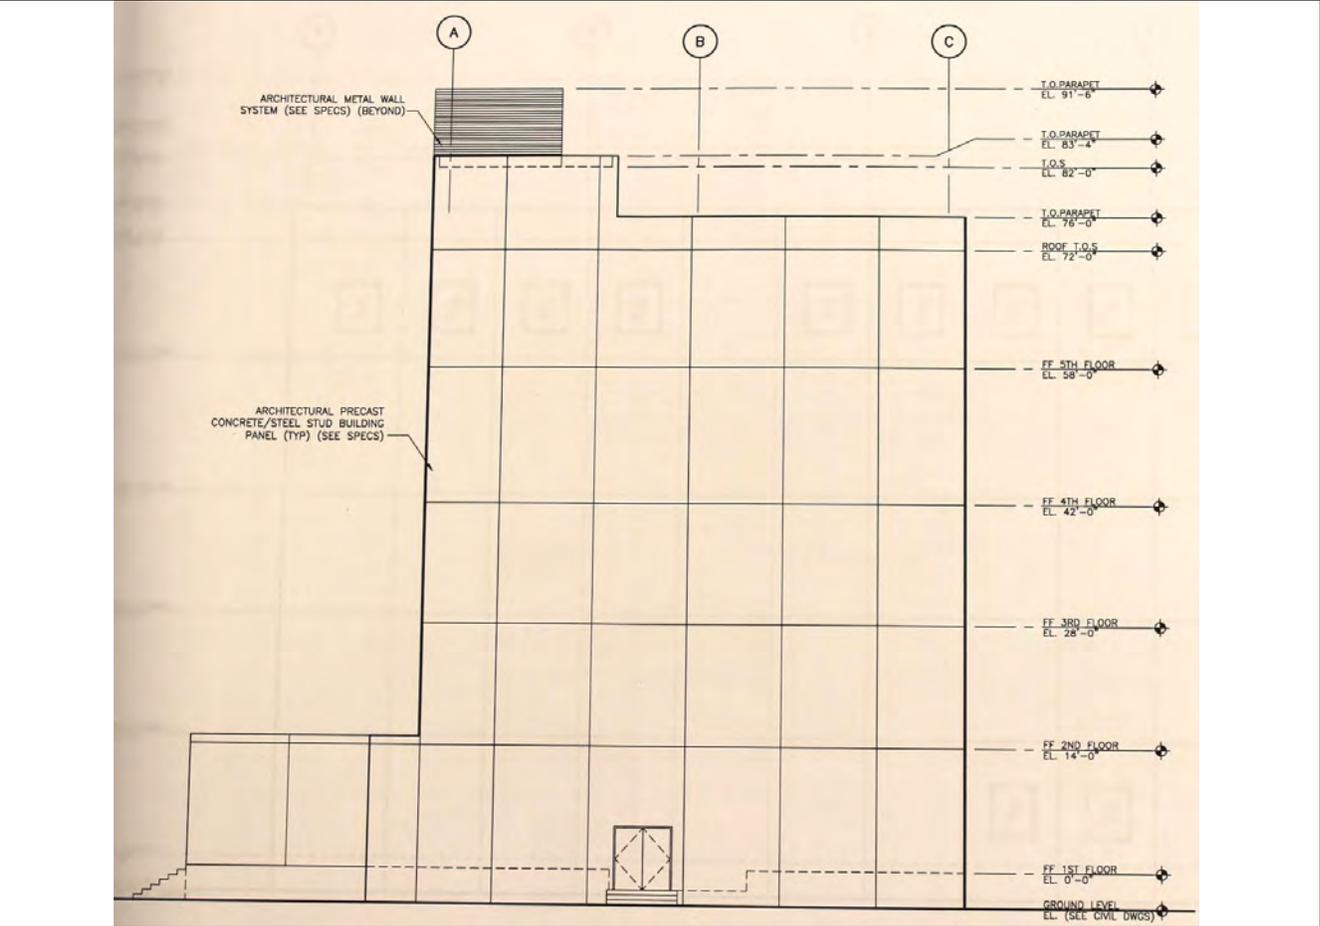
Architect's supplied drawing sheet: west elevation for the new Criminal Evidence and Processing Complex located at 2761 Gravier Street, New Orleans, LA.
